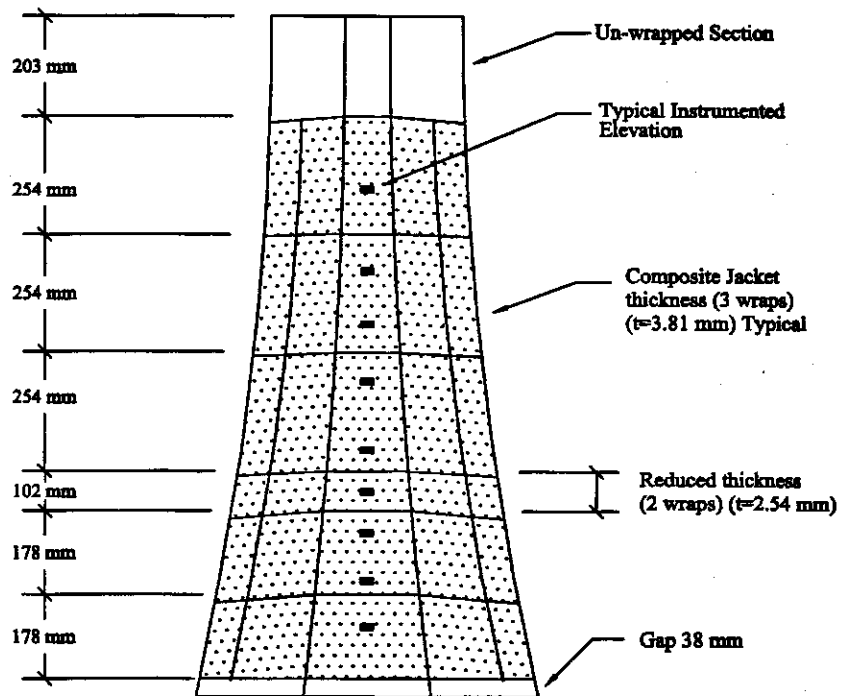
8 Elevation of FRG Jacketed Test Specimen
